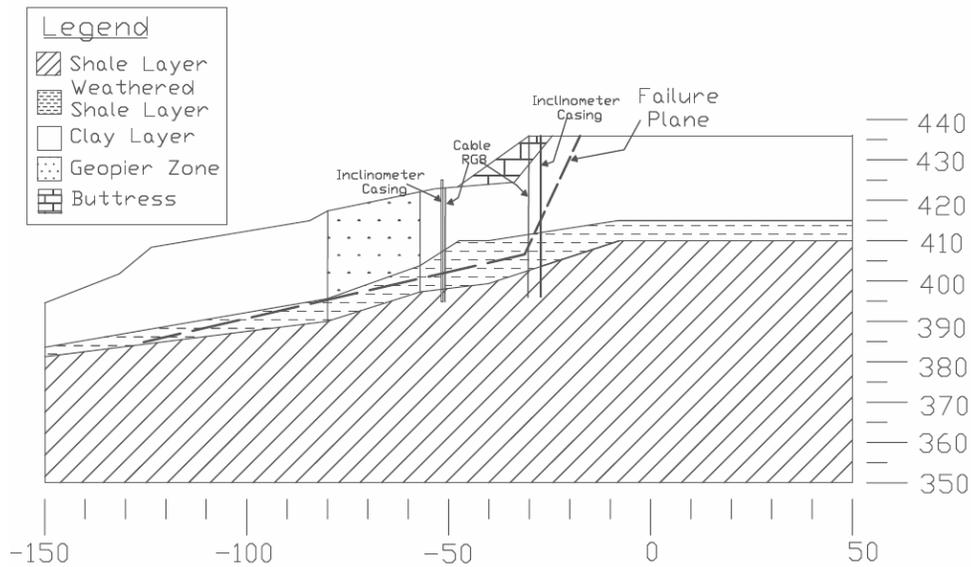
Pre-Stabilization Instrumentation Plan (units in Feet)
